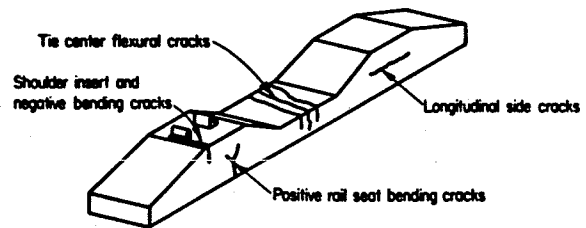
Typical flexural cracks in concrete ties.
